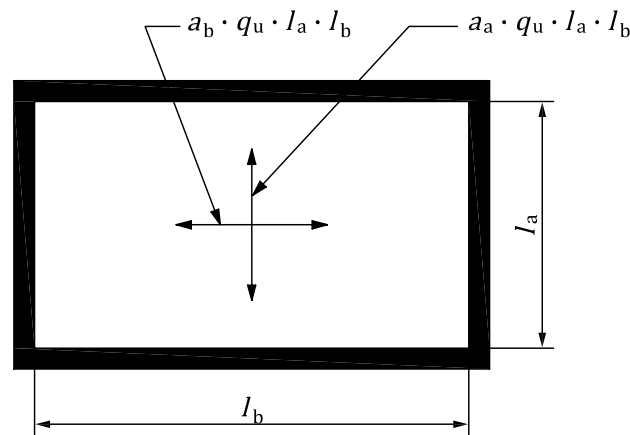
Fraction of the total load in the panel travelling in each direction in two-way slabs supported on girders, beams or structural concrete walls
